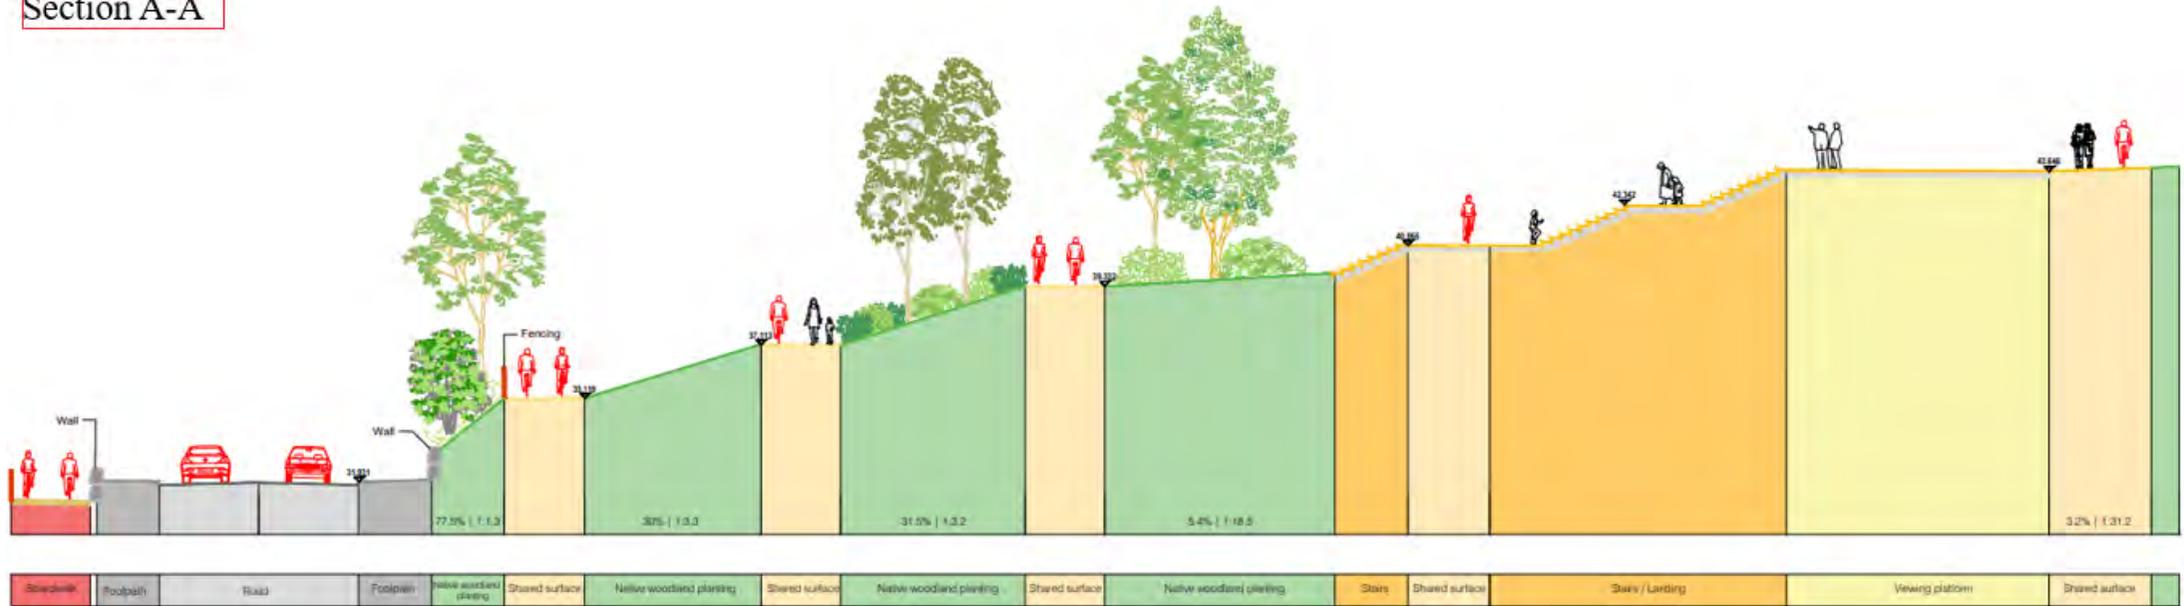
Section A-A through Brookvale and Boardwalk Conceptual Design
